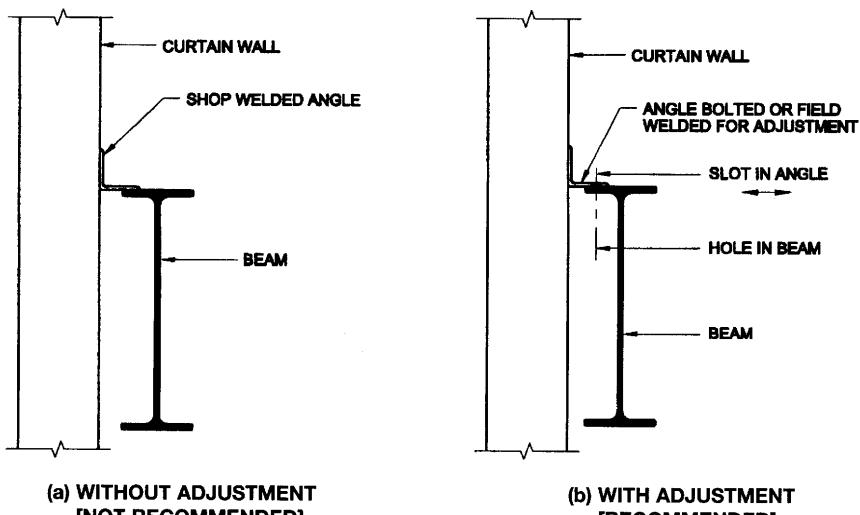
Attaching curtain-wall façade systems to structural steel framing.
